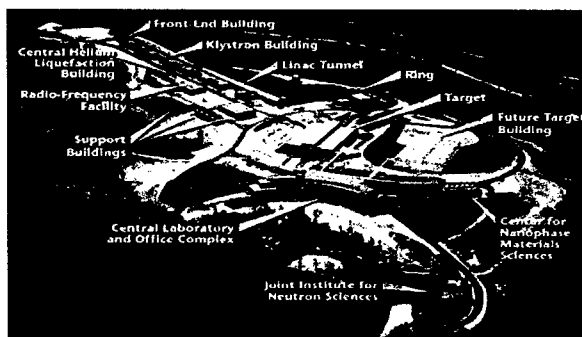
Artist's conception of the SNS facility overlaid on a early site photo of the Chestnut Ridge construction site at ORNL.
